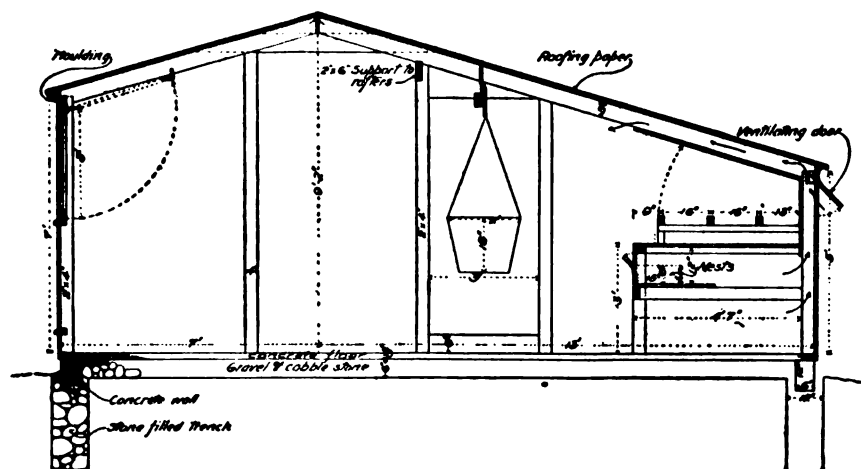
A cross-section plan of a Cornell poultry house with pens 20 feet square, adapted to the combination roof and ceiling around perches only
